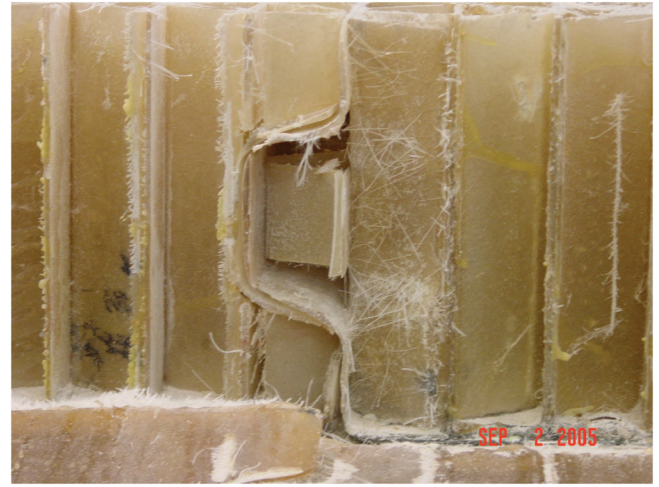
View of Longitudinal Joint; Side Removed, Showing Voids – KSCI #P1a Test
